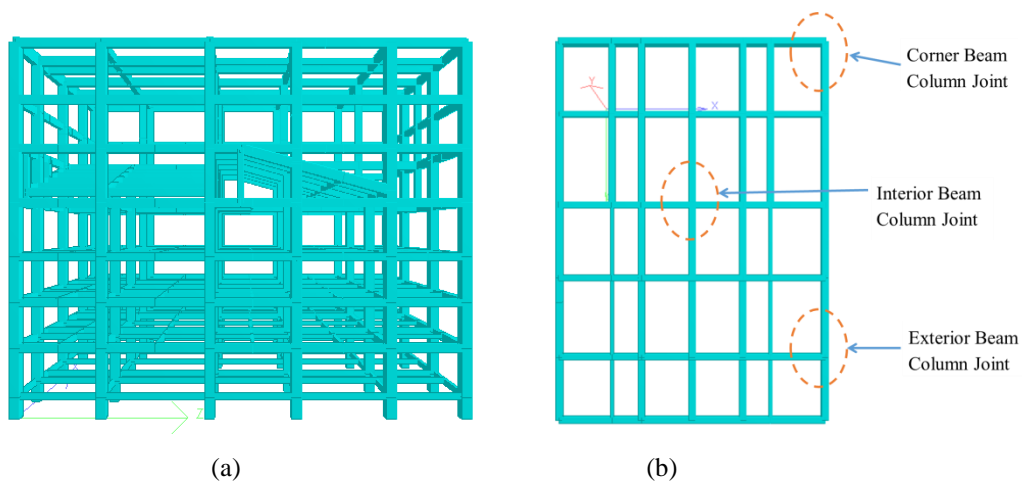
(a) STADD Modal of Multi-Story Framed Structure; (b) Plan of Multi-Story Framed Structure
